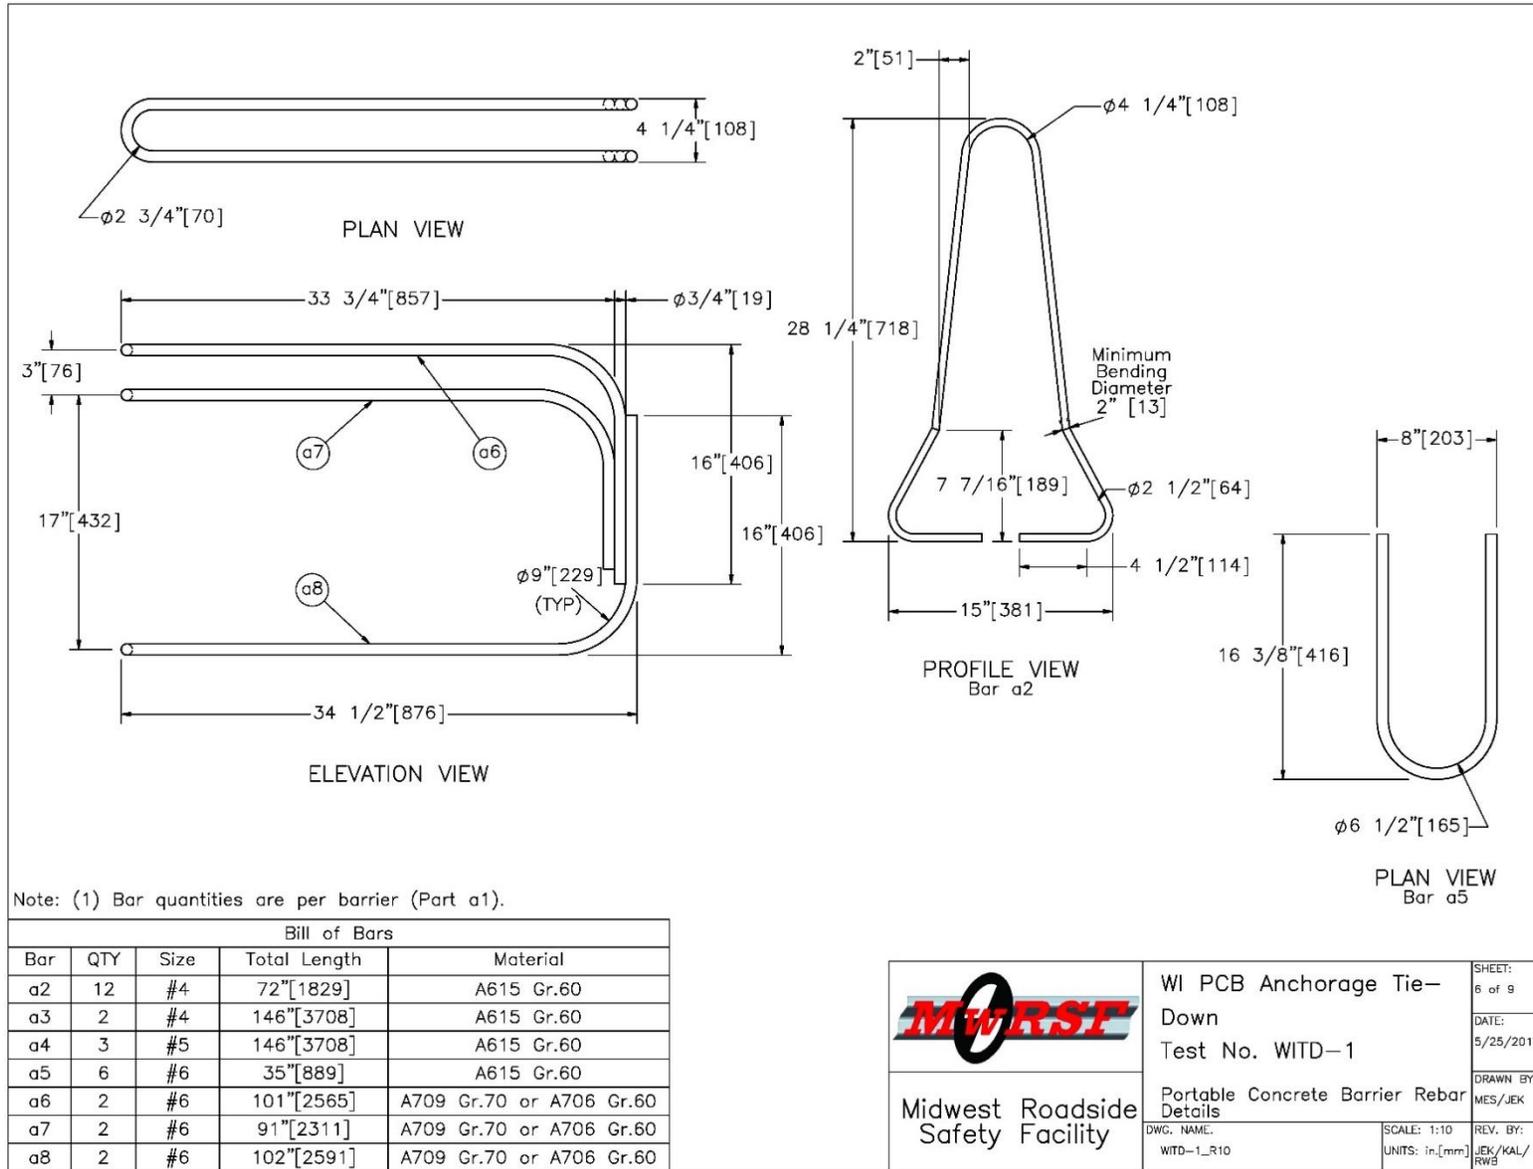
Portable Concrete Barrier Details, Test No. WITD-1
